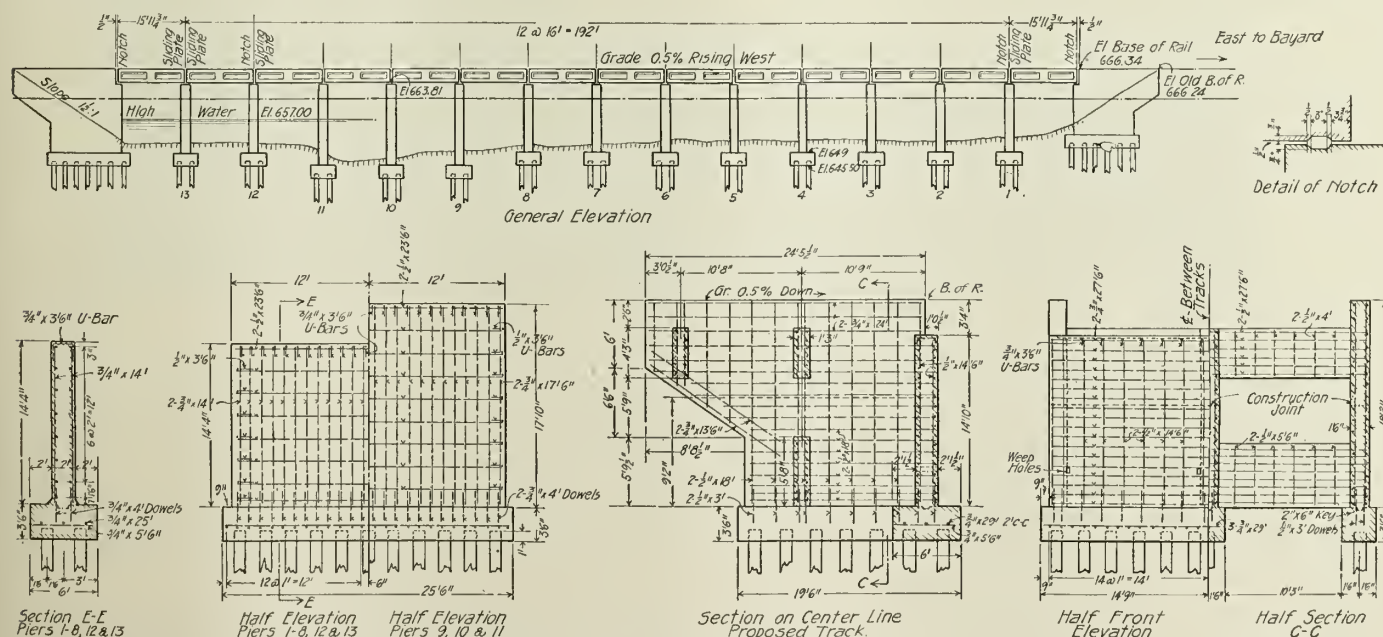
Reinforced Concrete Double-Track Trestle, Fourteen 16-Foot Spans, 2 1/4 Miles West of Bayard, Ia., C., M. & St. P. Ry.
